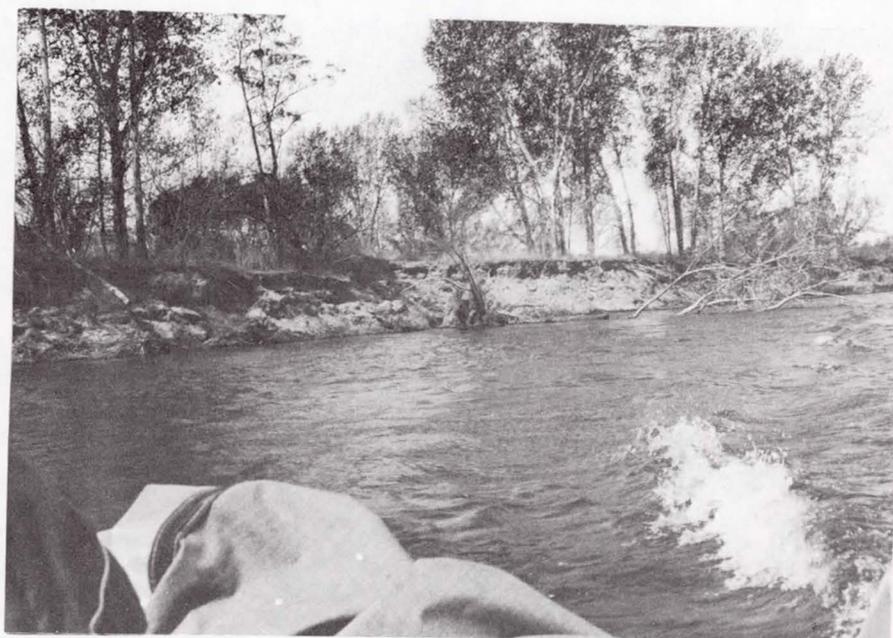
Typical downstream bankline along Pretty Point-Phase I Area prior to construction. (Photo taken 22 May 1980)
